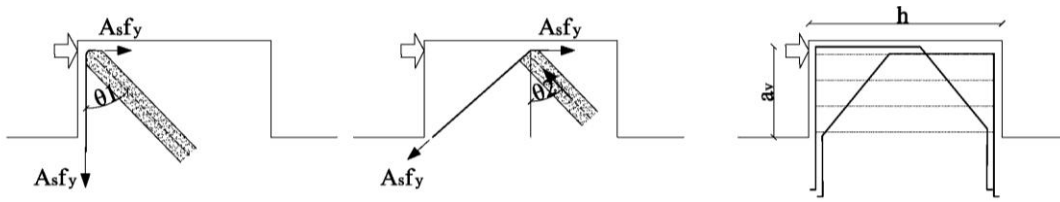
Features of short corbels with an arrangement of inclined reinforcement bars.
